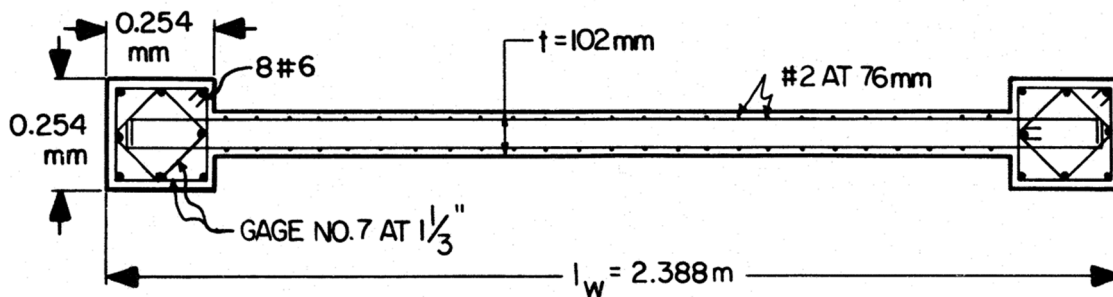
Detailed Cross-Section of Framed Wall (Vallenas et. al. 1979)
